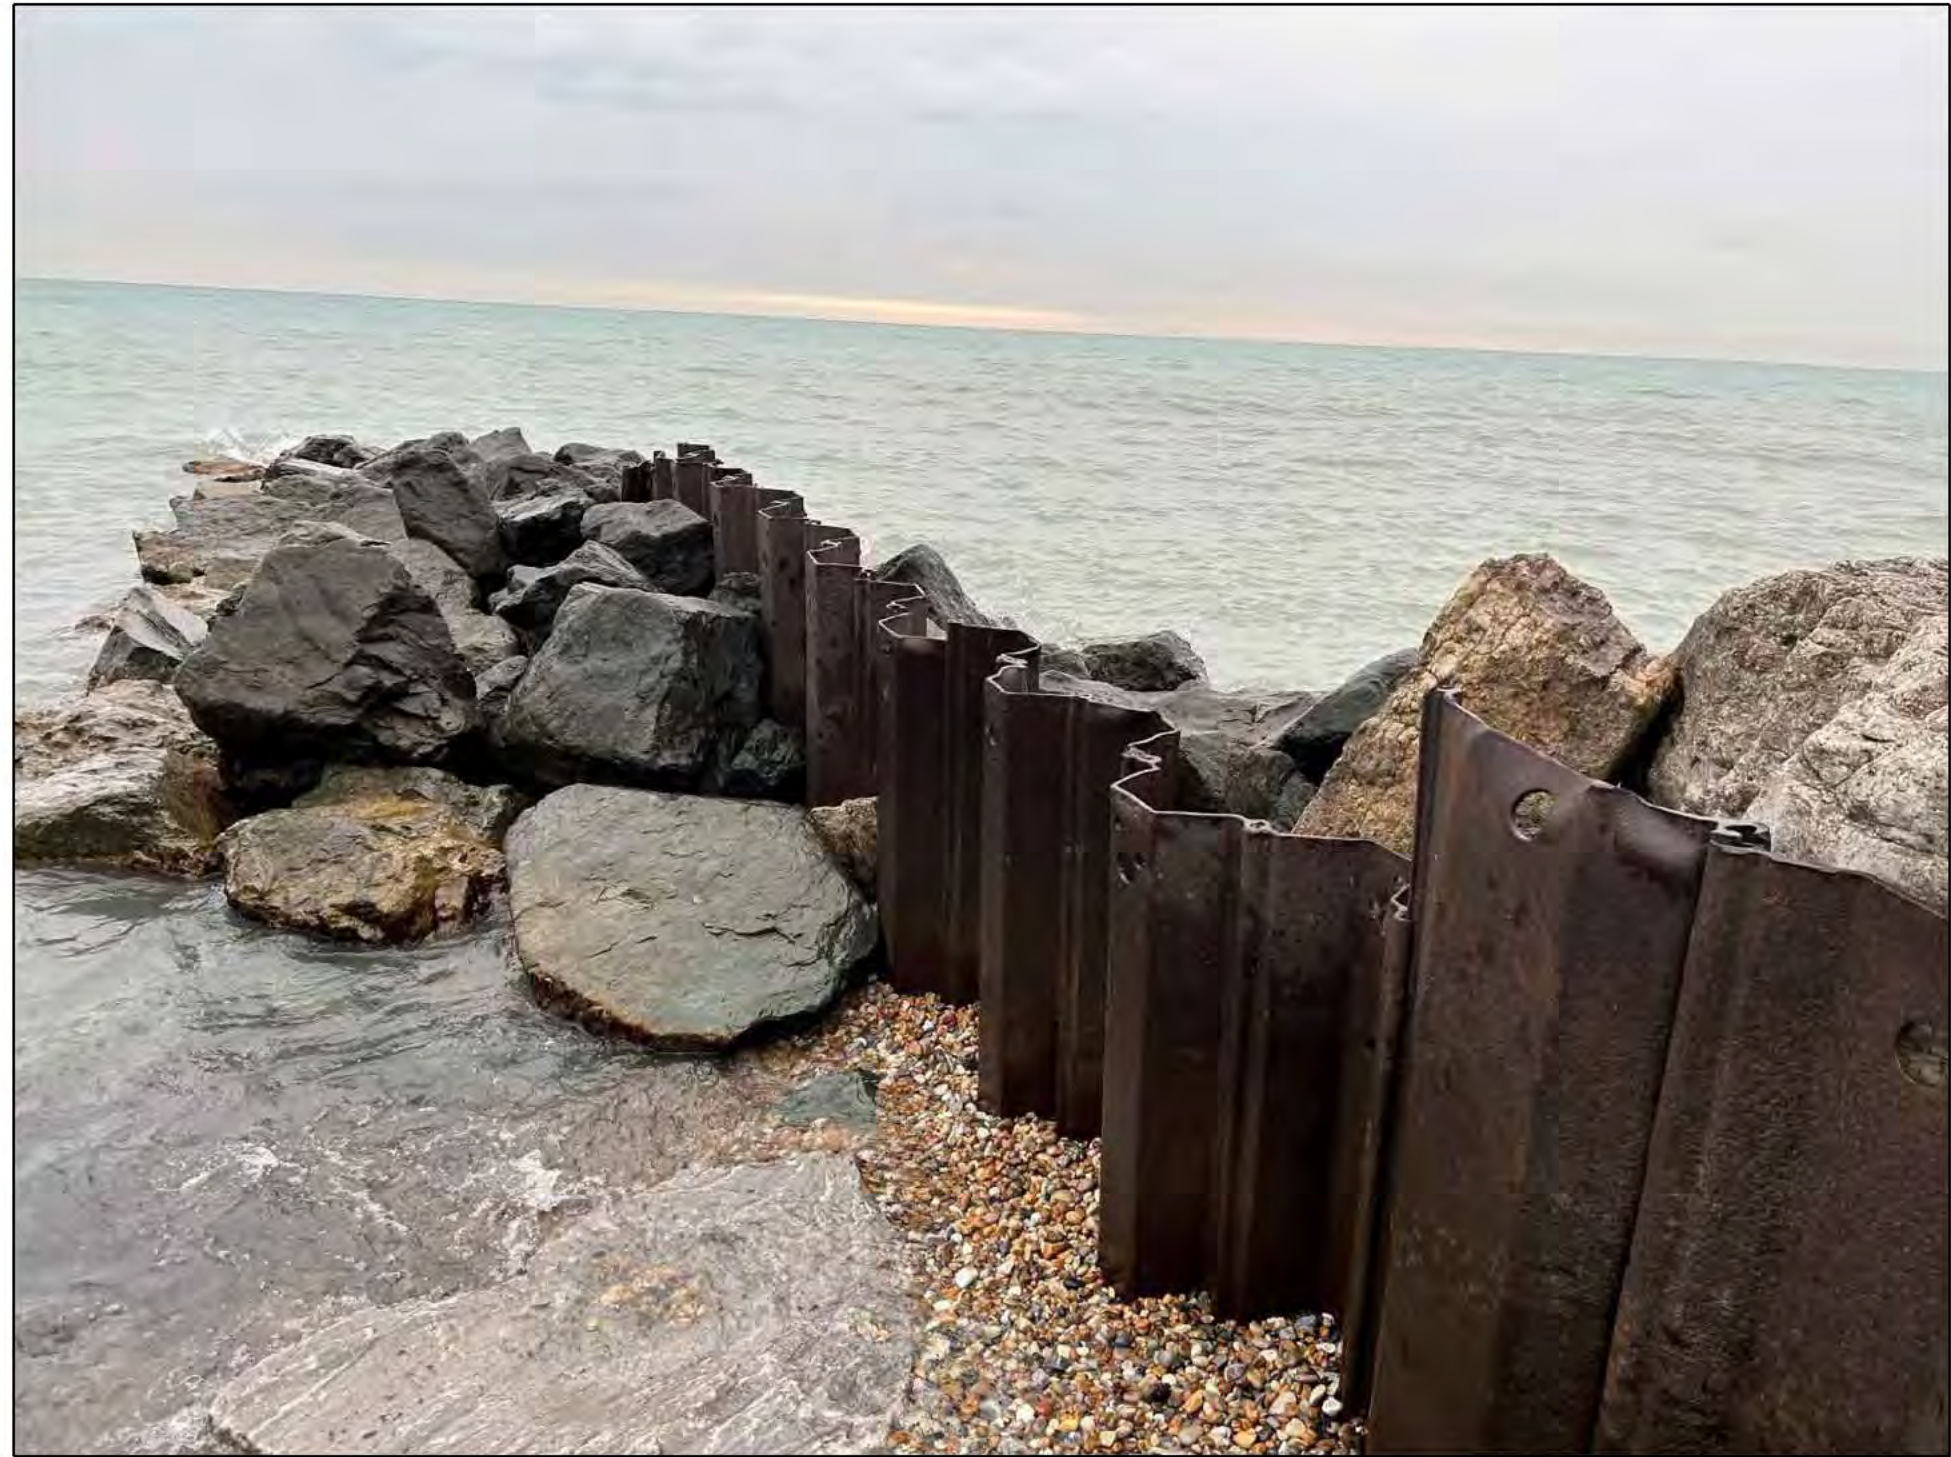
LOOKING EAST AT EXISTING STEEL SHEET PILE AND ARMOR STONE GROIN.
